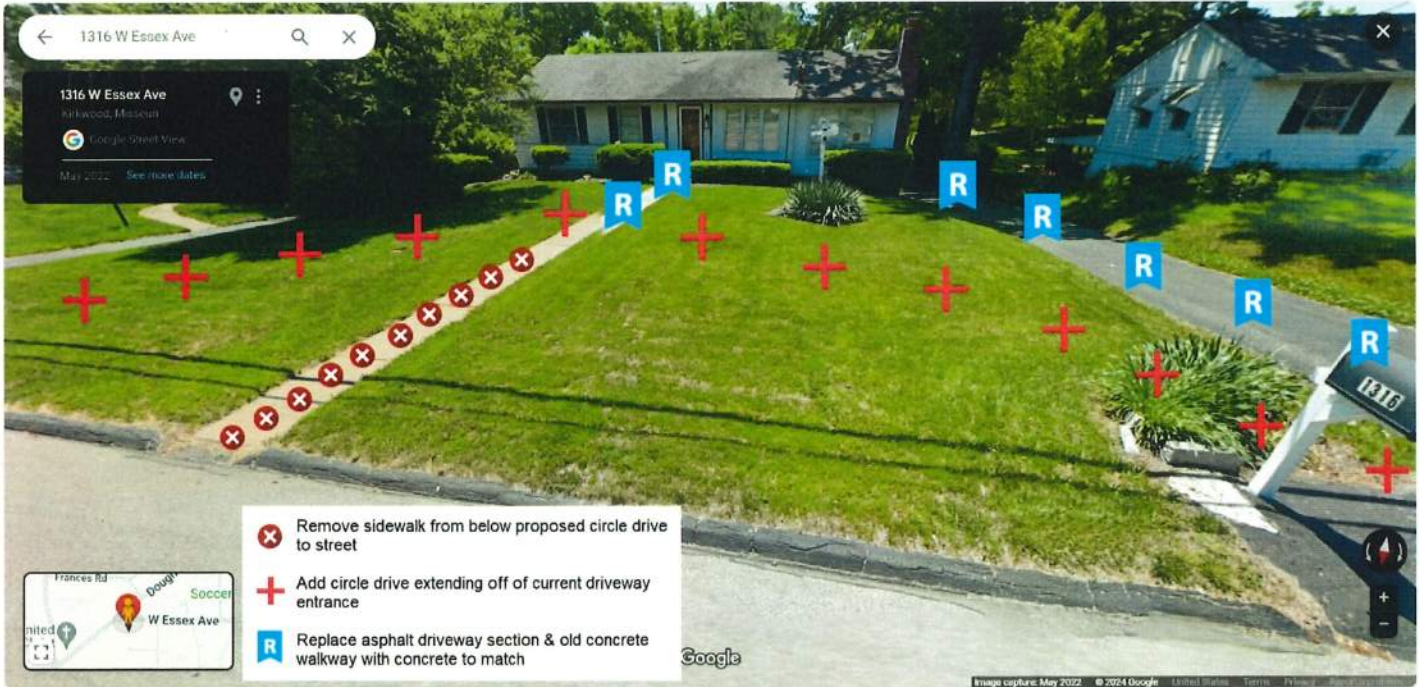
Driveway view that shows the limitations to widening the current driveway to align with property line.
